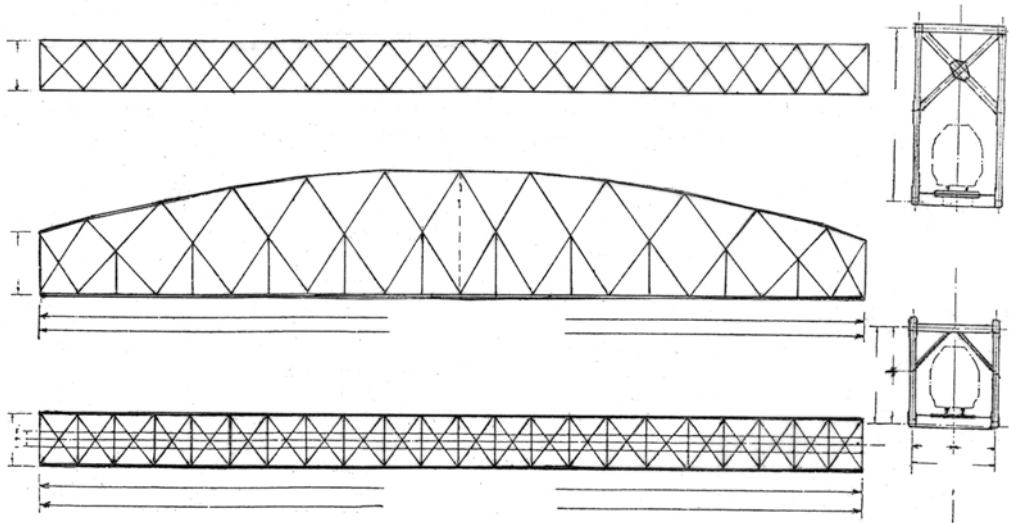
SCHEMATIC SKETCH OF KRCL- STEEL GIRDER
